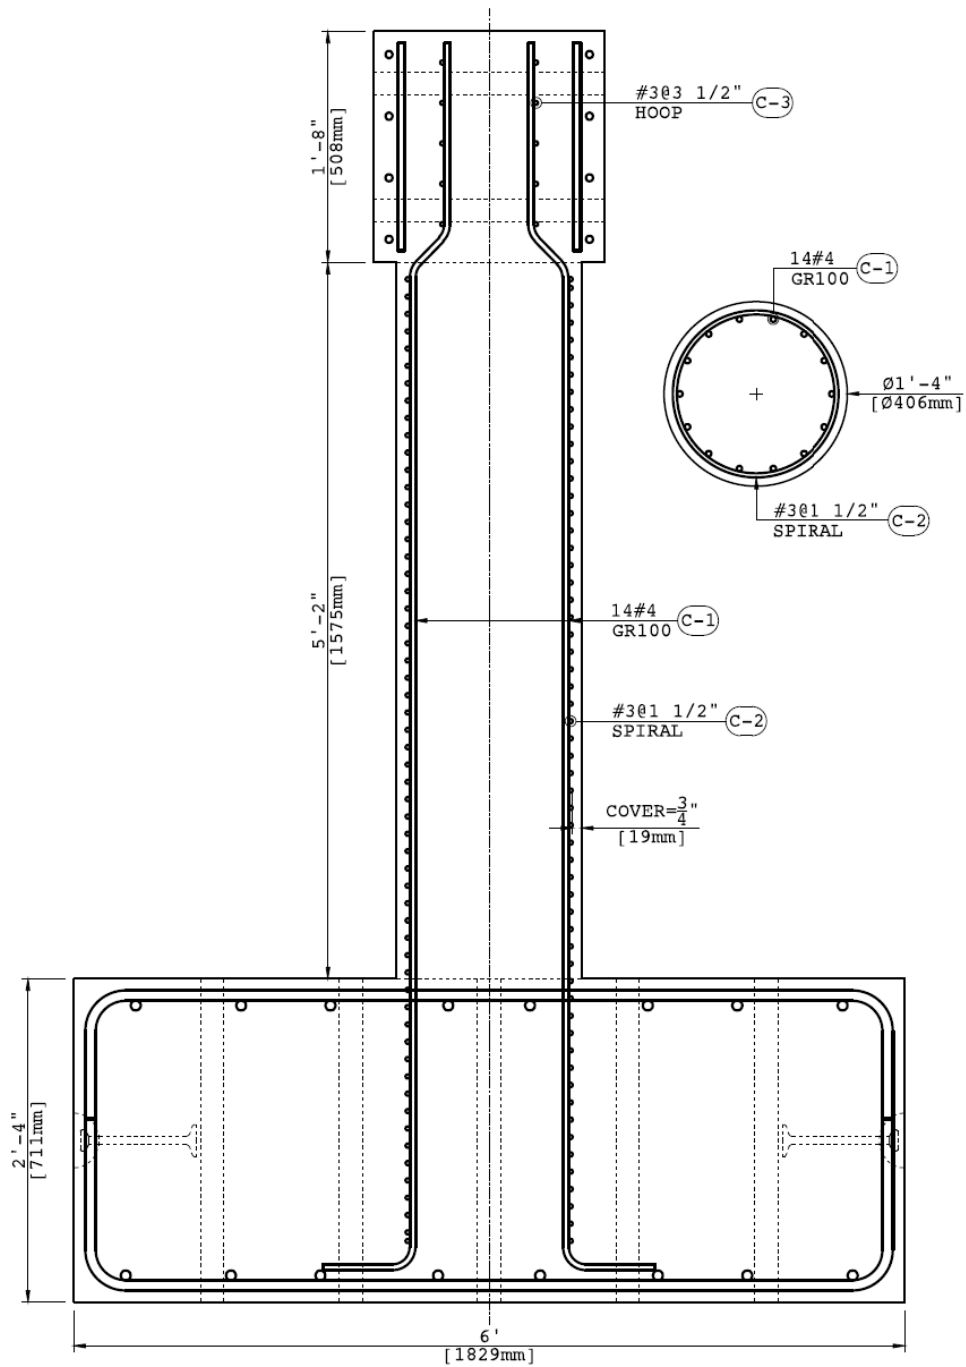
Column LD-S1.5-G100: reinforcement details.
